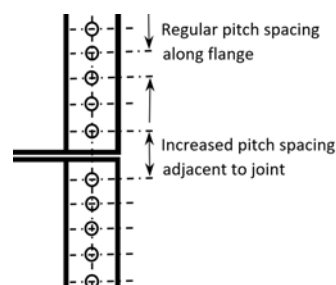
Inconsistent Vertical Bolt Spacing Local to Horizontal Joints, Amplifying Some Bolt Loads
